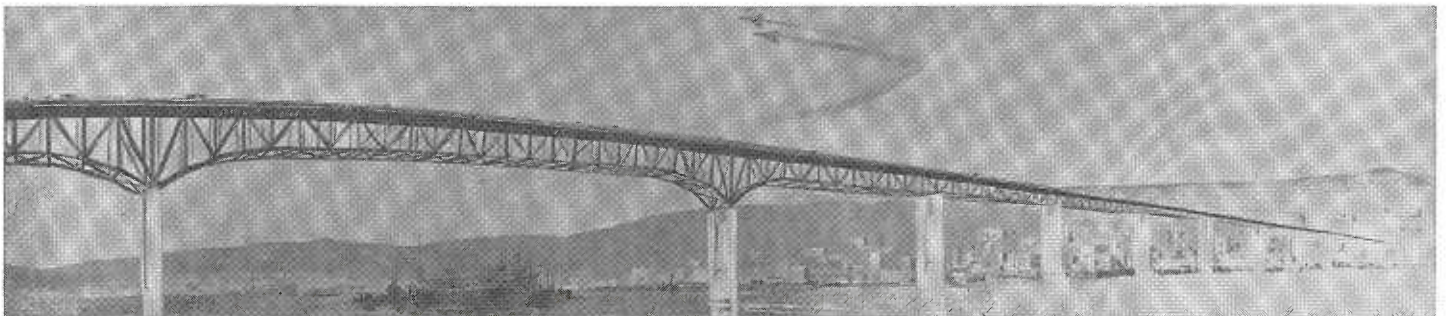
PHOTO ABOVE shows recommended bridge line "E" between Fourth Street in Coronado to Crosby Street in San Diego. The view is northeastward. PHOTO BELOW is of an architectural drawing showing the deck-type truss proposed for bridge spans in the 960-foot range.
